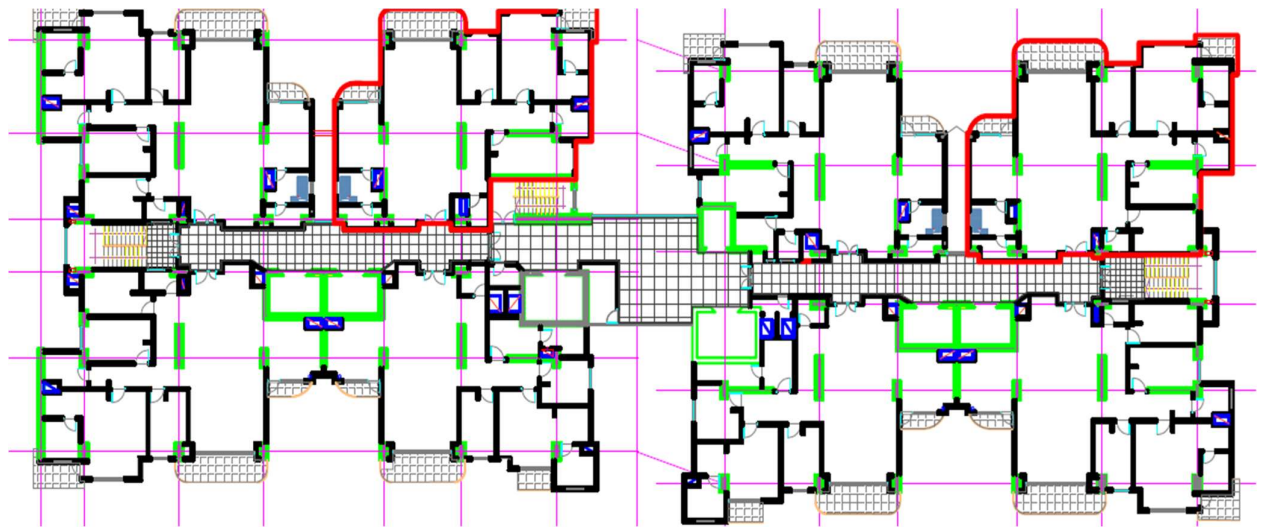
PRD-04 Real Estate Lebu Site Floor Plan
